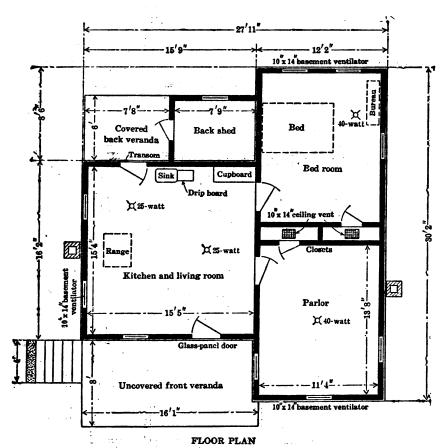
Plan and elevation of miner's frame cottage. (Bulletin 87, U. S. Bureau of Mines.)
